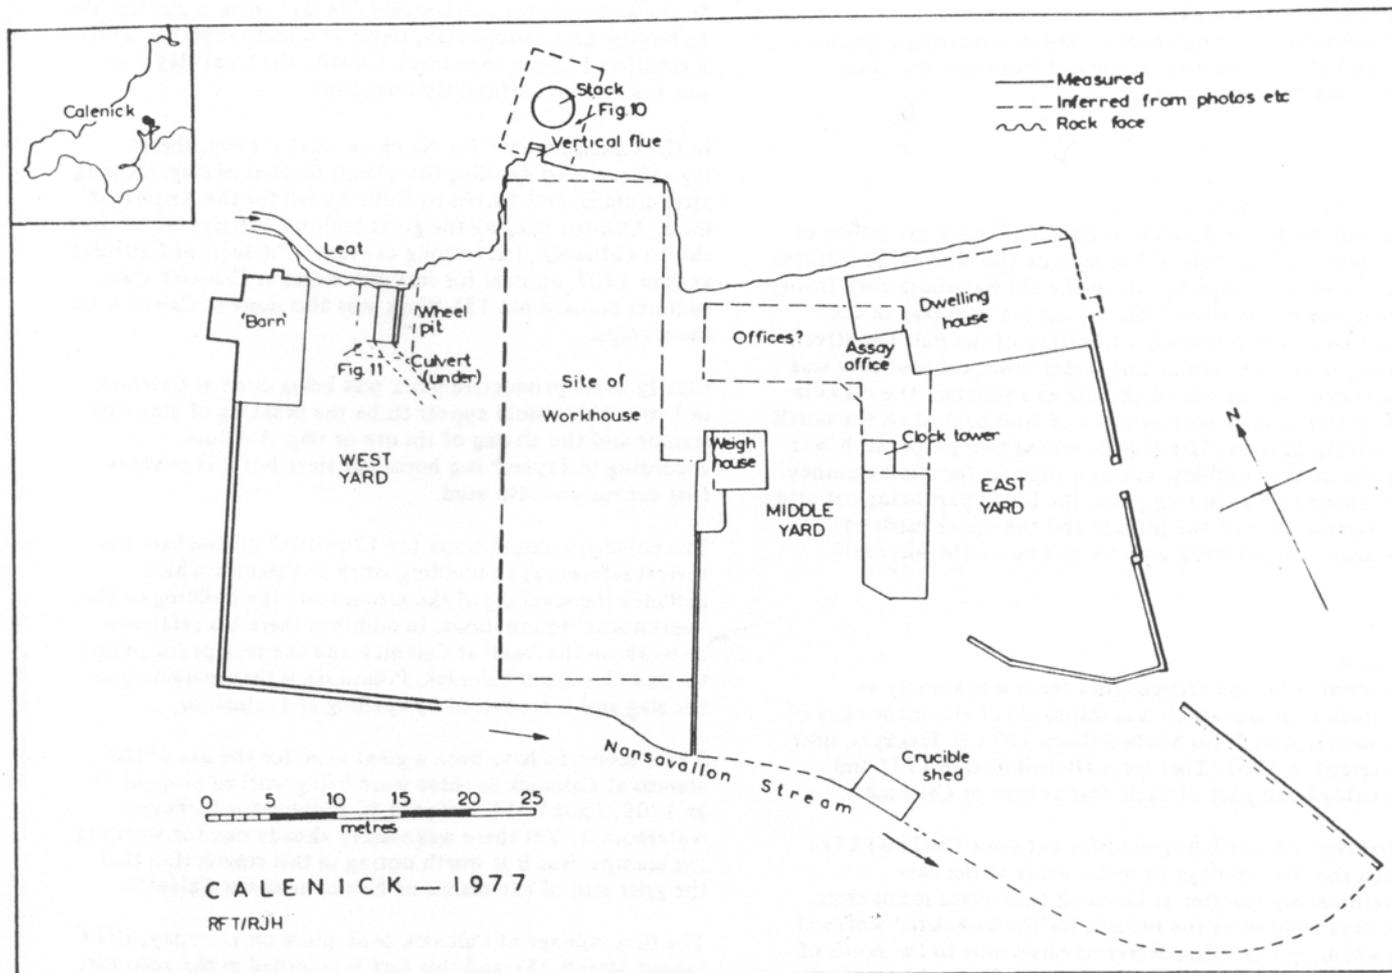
Plan of site of Calenick showing location of site in Cornwall and position of Figs 10 and 11.
